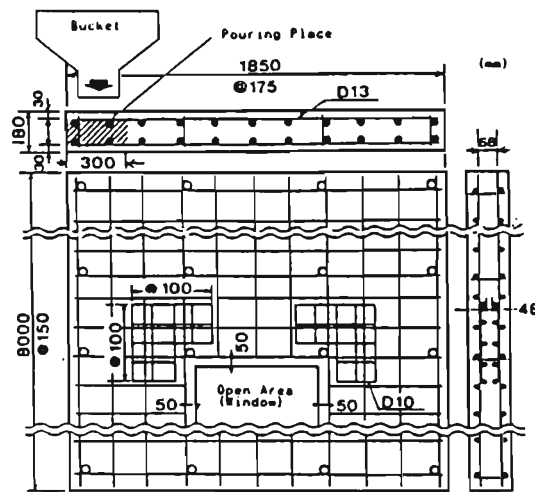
Tall wall model and reinforcement (after Miura et al, 1993)
